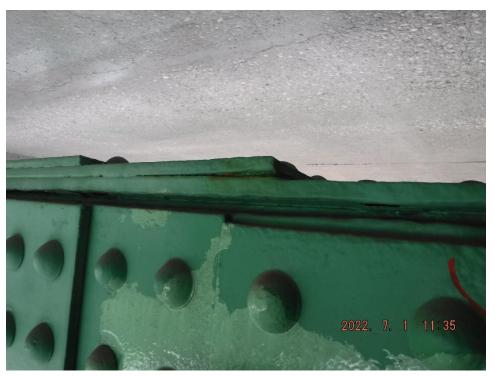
Example of pack rust and splice plate deformation (Center Truss, Span 9, U35-U36 at U36 shown)
